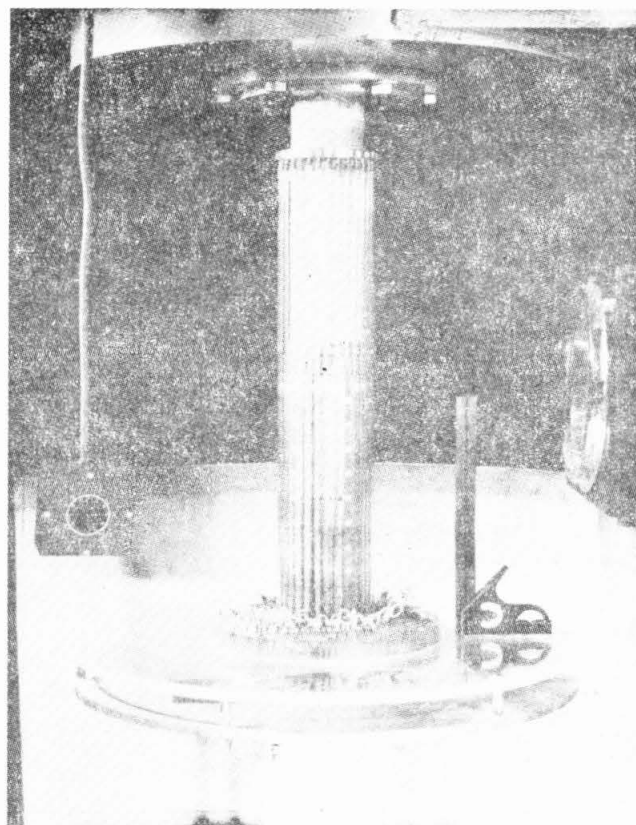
VIEW OF EXPERIMENTAL SETUP
